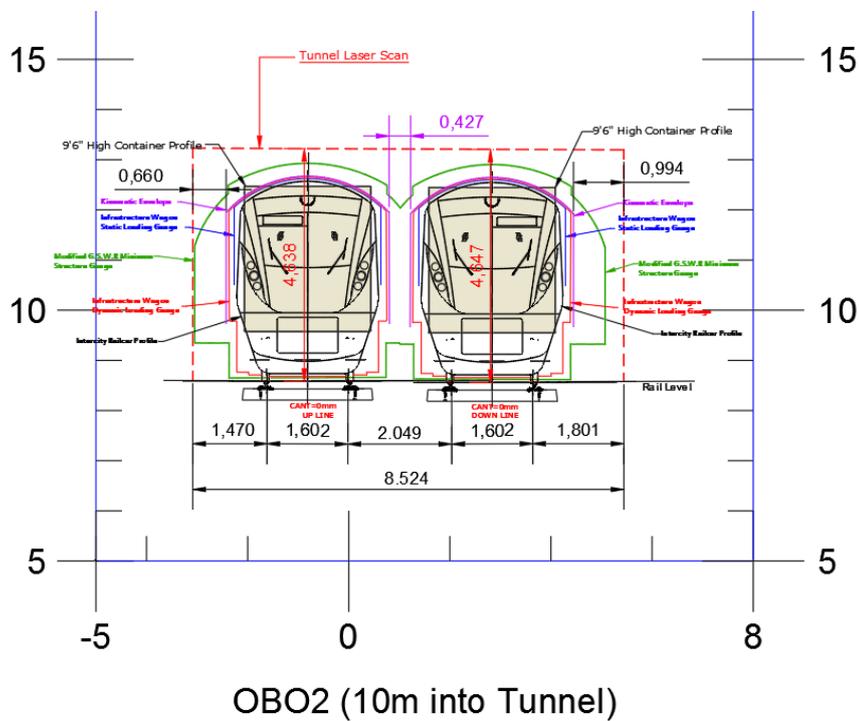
Track Cross Section under OB02 Conyngham Road Bridge at 10m into Tunnel
